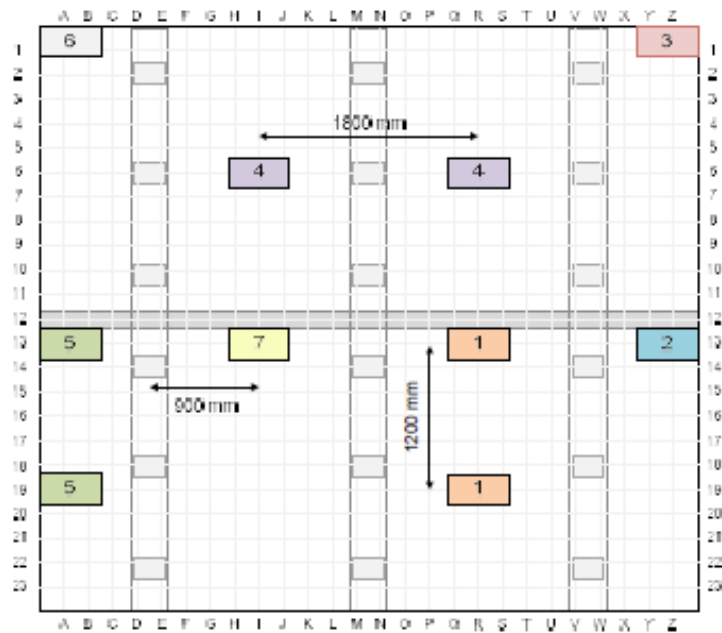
Loading plan of AFRP bridge deck (Gar 2012)
